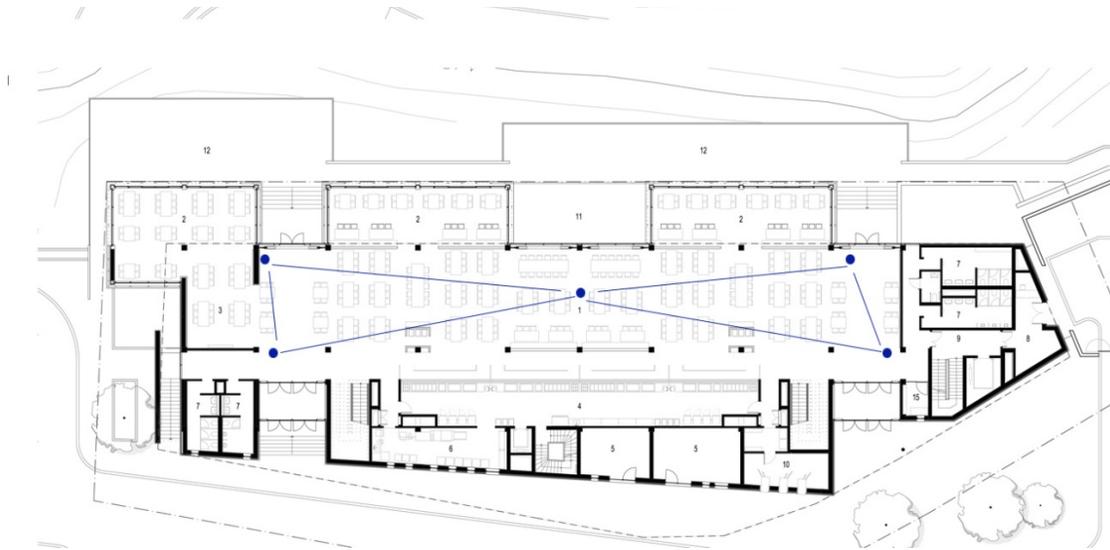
Marmara eating facility's first floor plan and 5 measurement points
